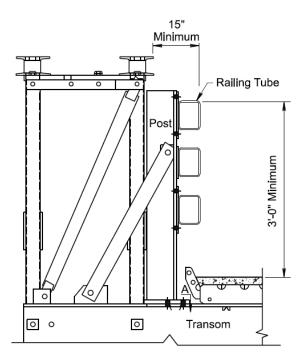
Vehicular Railing Offset Requirement for Railing Height of 3 feet
